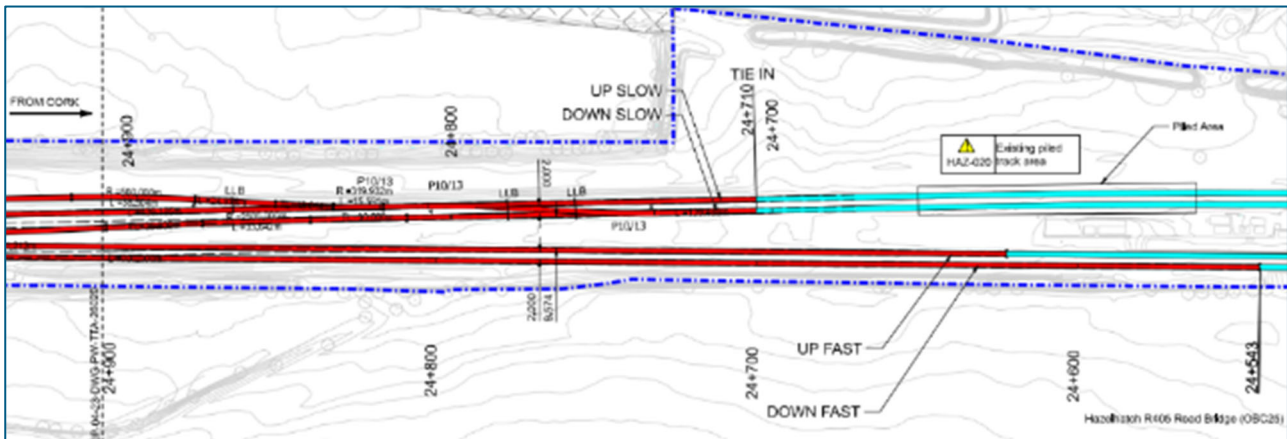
Hazelhatch & Celbridge Station – Track Plan Layout (2 of 3)
